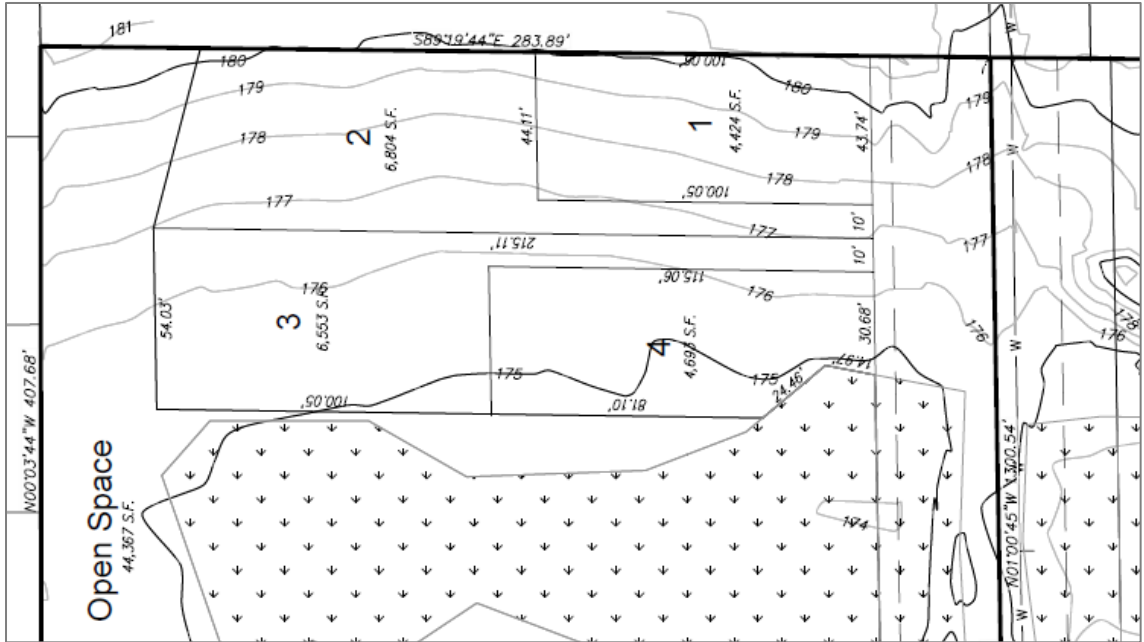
PRE 21-25 draft subdivision plan
